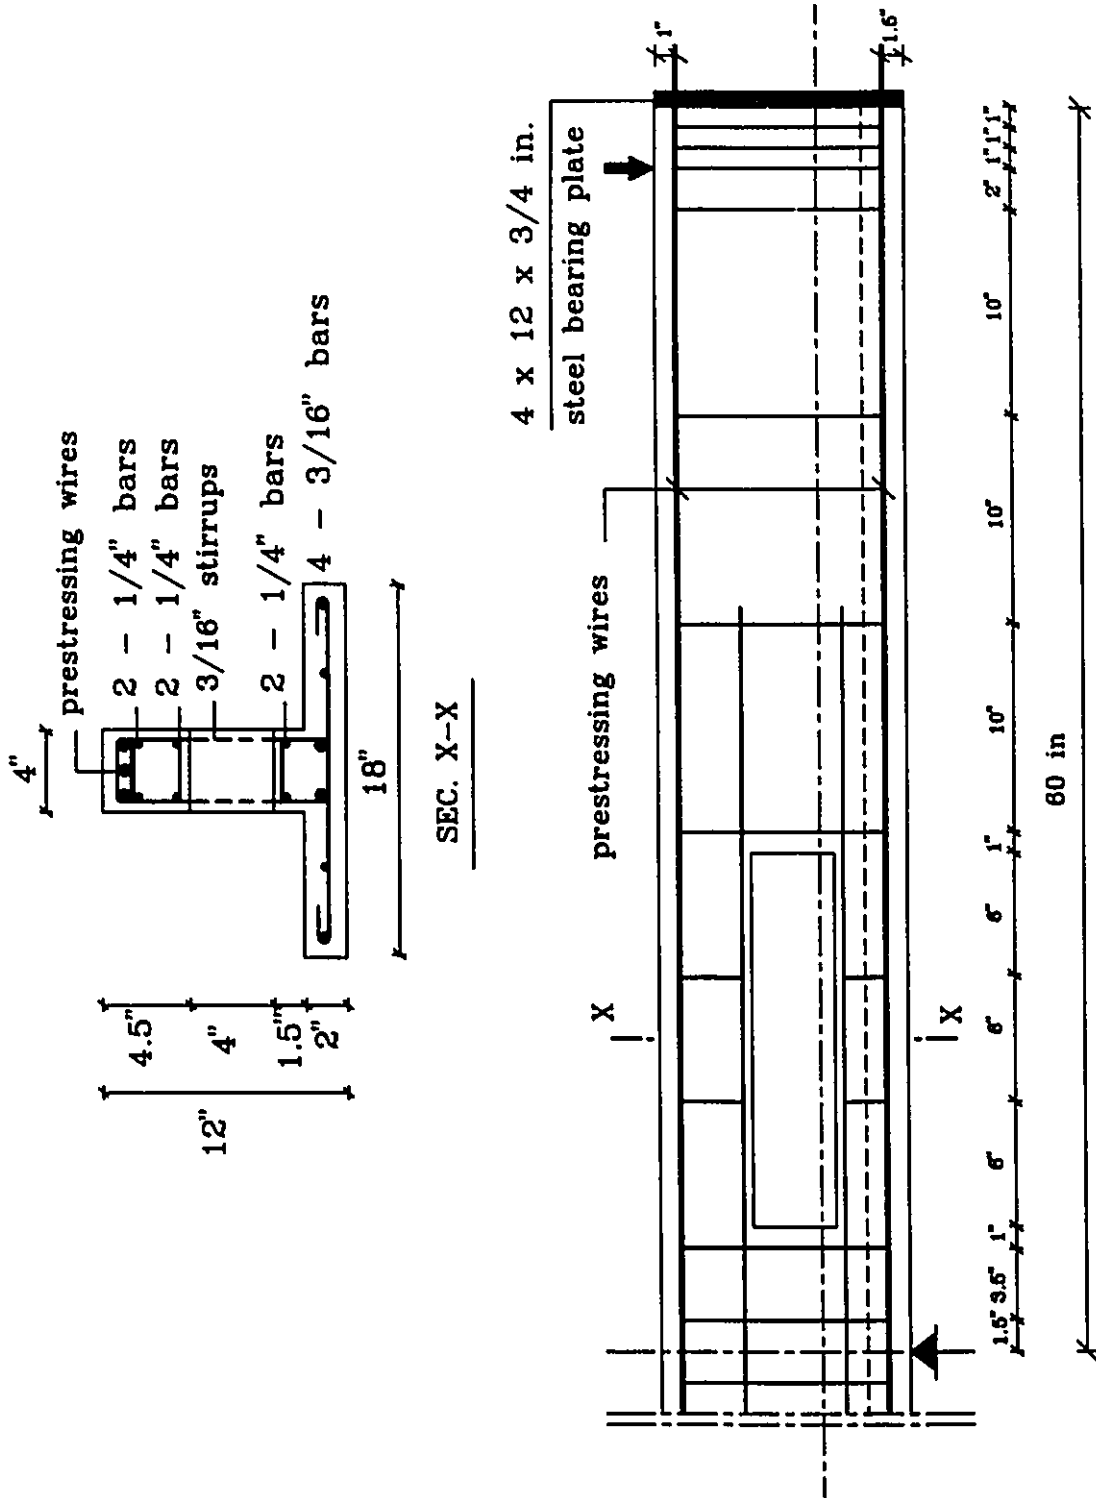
REINFORCEMENT DETAILS FOR BEAM BIII1A
